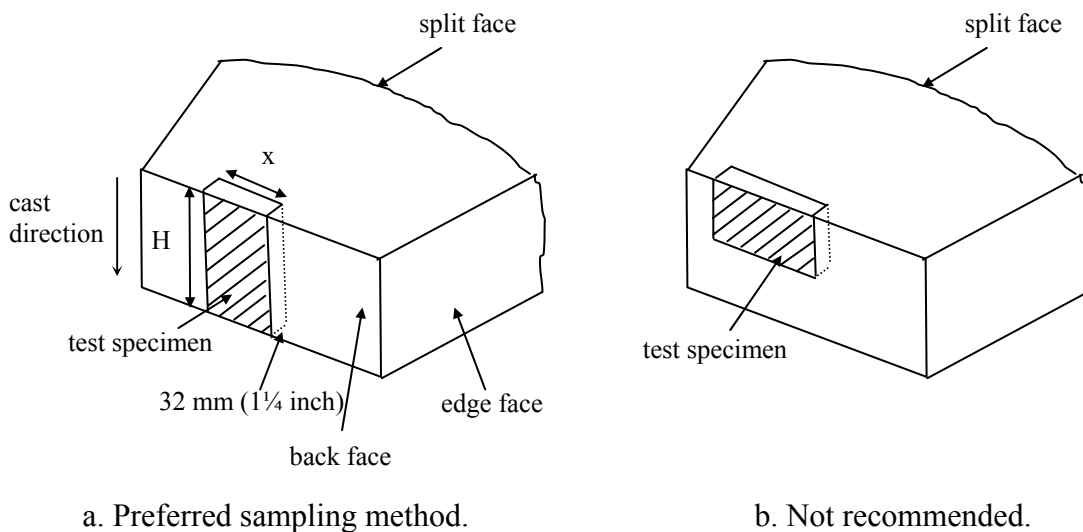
Drawings. Extraction of freeze-thaw specimens from SRW unit.
